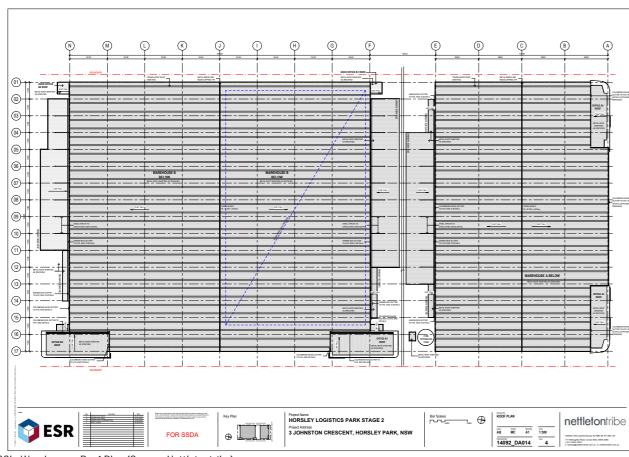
Warehouse - Roof Plan (Source: Nettletontribe)
